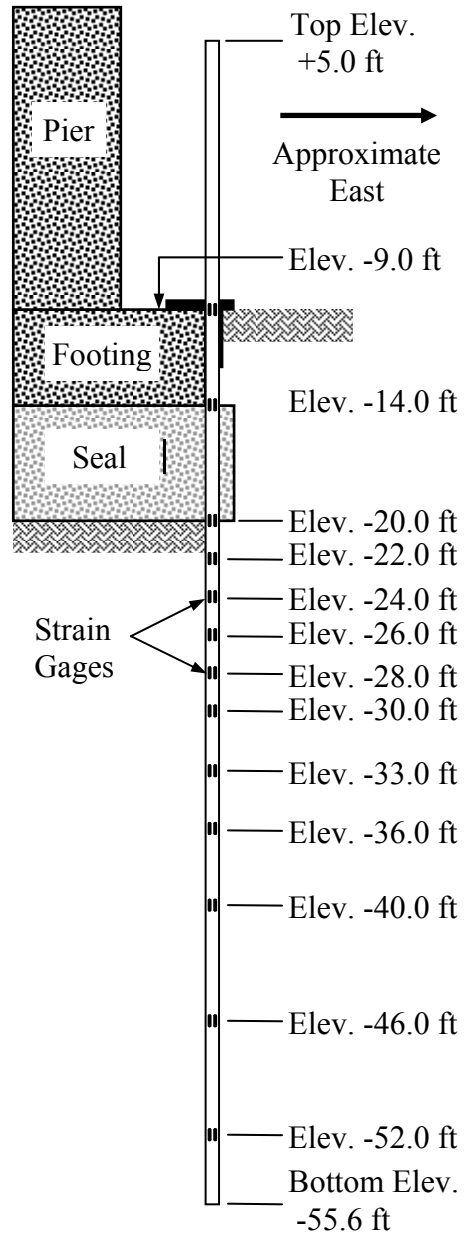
Section Elevation of As-Built ZW Mini-Pile
